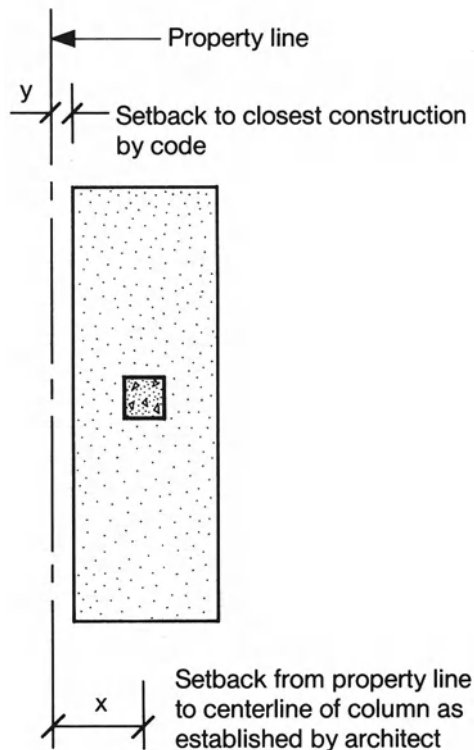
Rectangular footing solution to problem of column positioned adjacent to property line.
